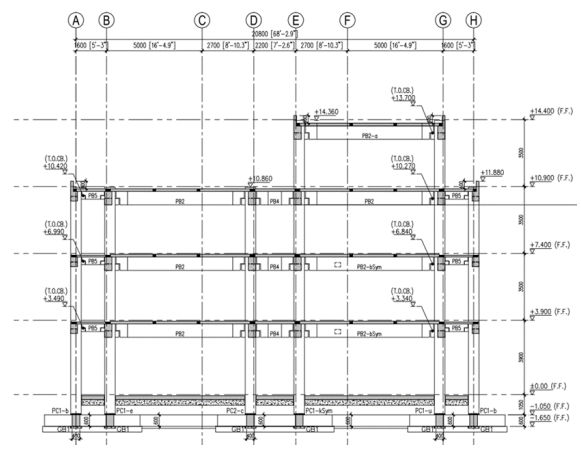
TRANSVERSE ELEVATION OF STRUCTURAL PRECAST CONCRETE FRAME SYSTEM
